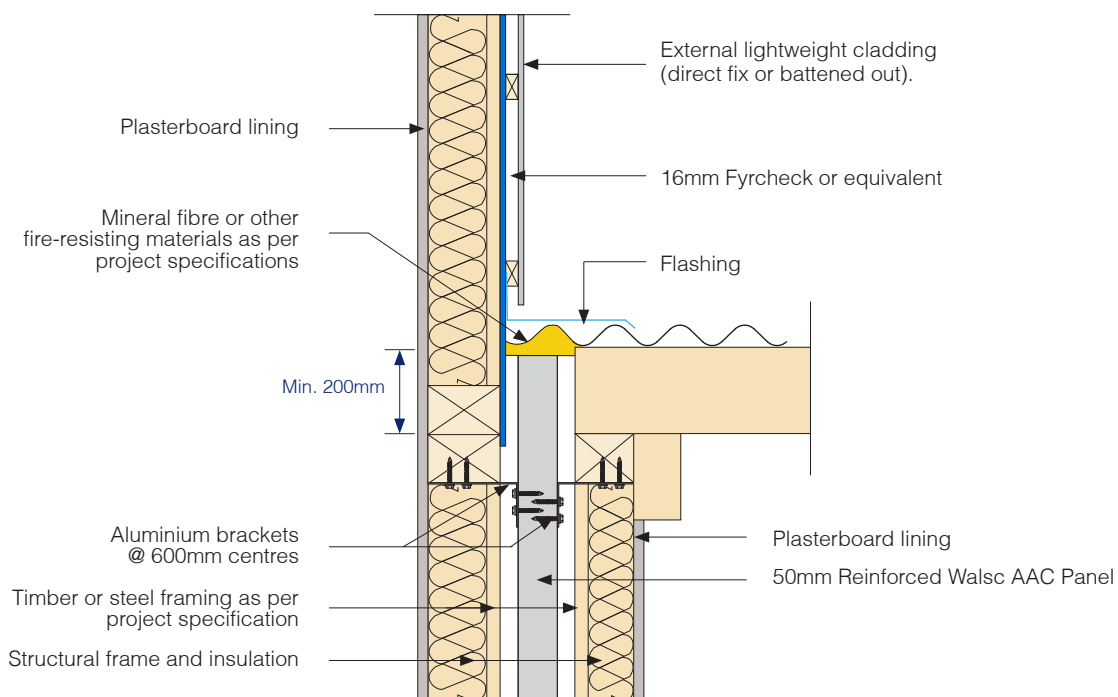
Vertically Aligned System Inter-tenancy Wall to External Walls Detail B
